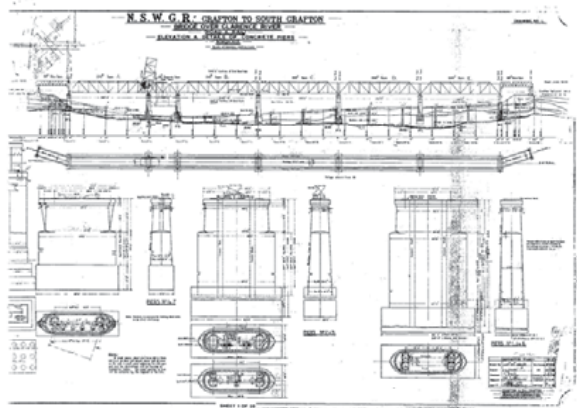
Construction drawings for Grafton Bridge, dated 1926.
